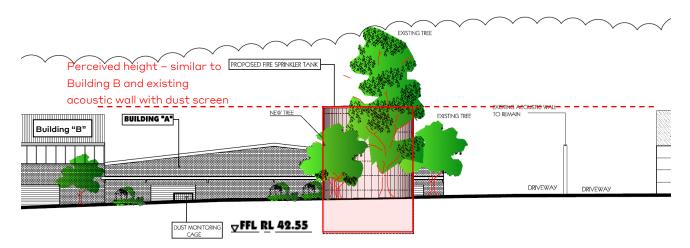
Tattersall Road Elevation: with proposed fire tank envelope
